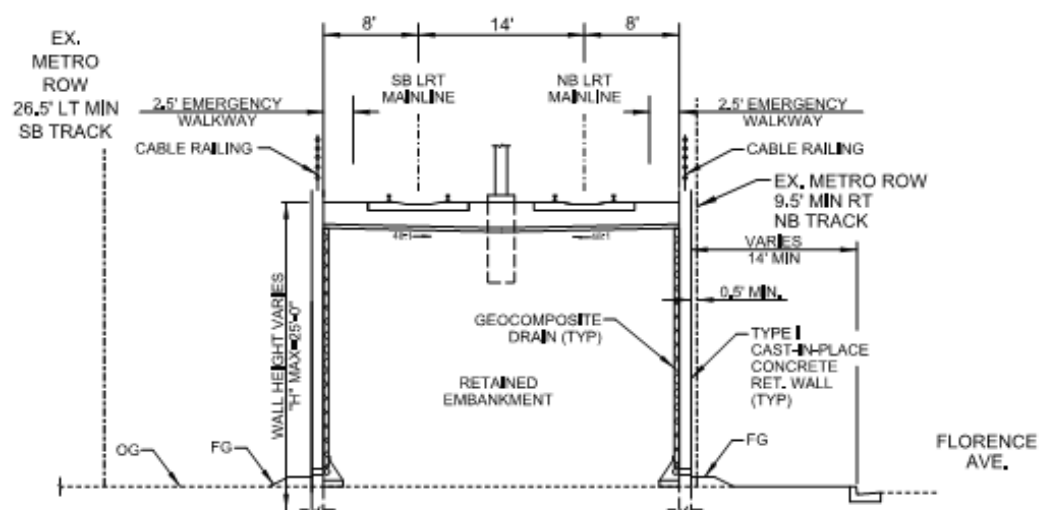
Alternative 1A – Preliminary Bridge Section
